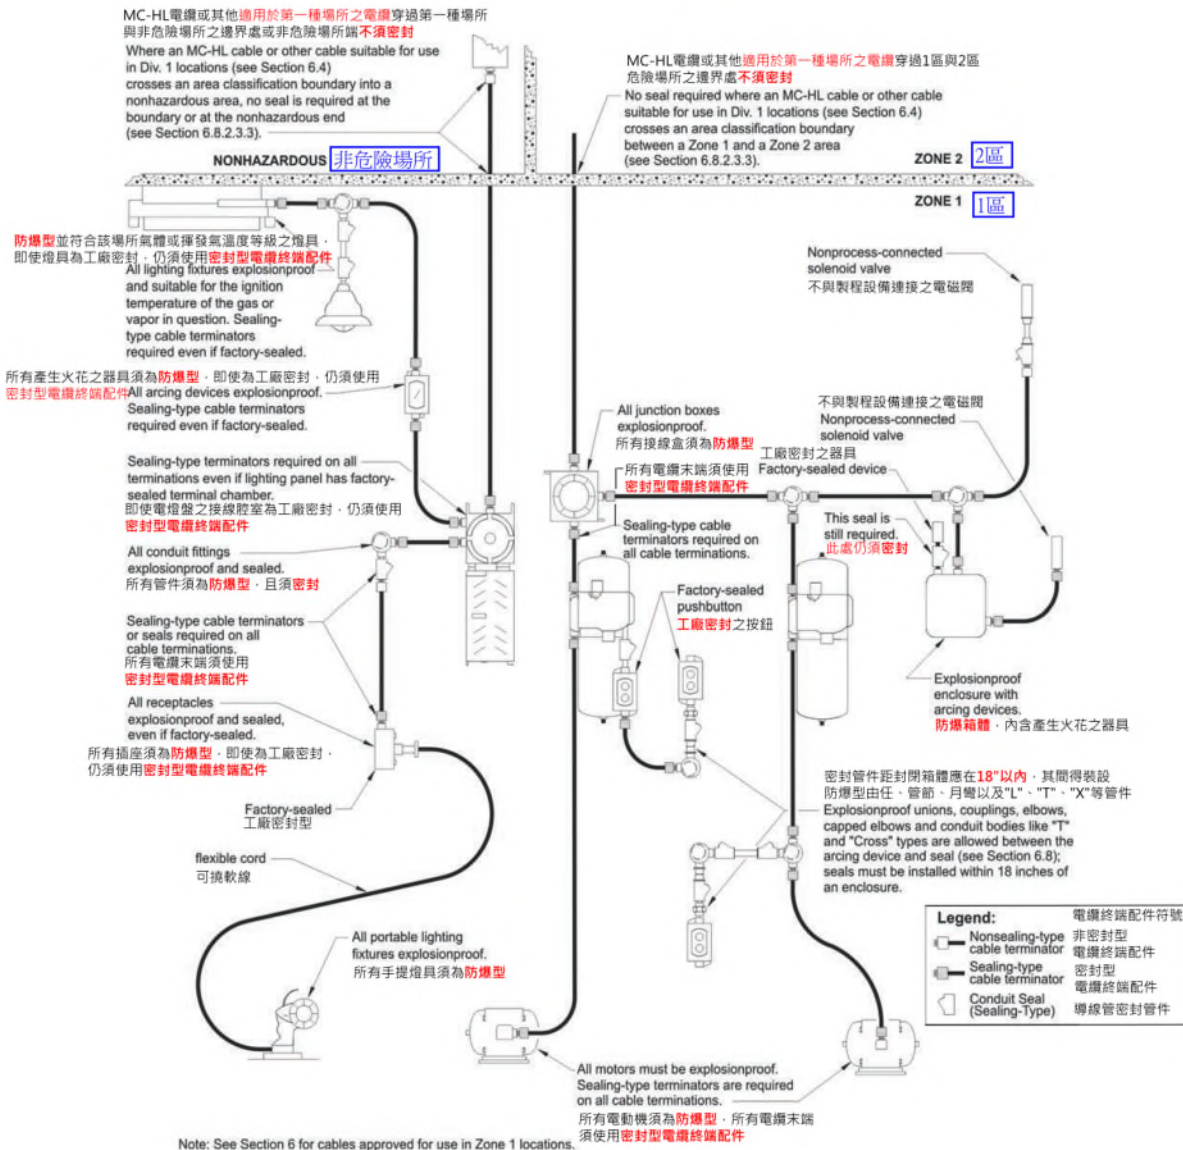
Typical Class I, Zone 1 Electrical Installation Cable System Utilizing Class I, Division 1 Equipment and Wiring Methods
